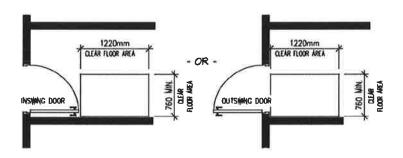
CLEAR FLOOR AREA BEYOND SWING OF DOOR
